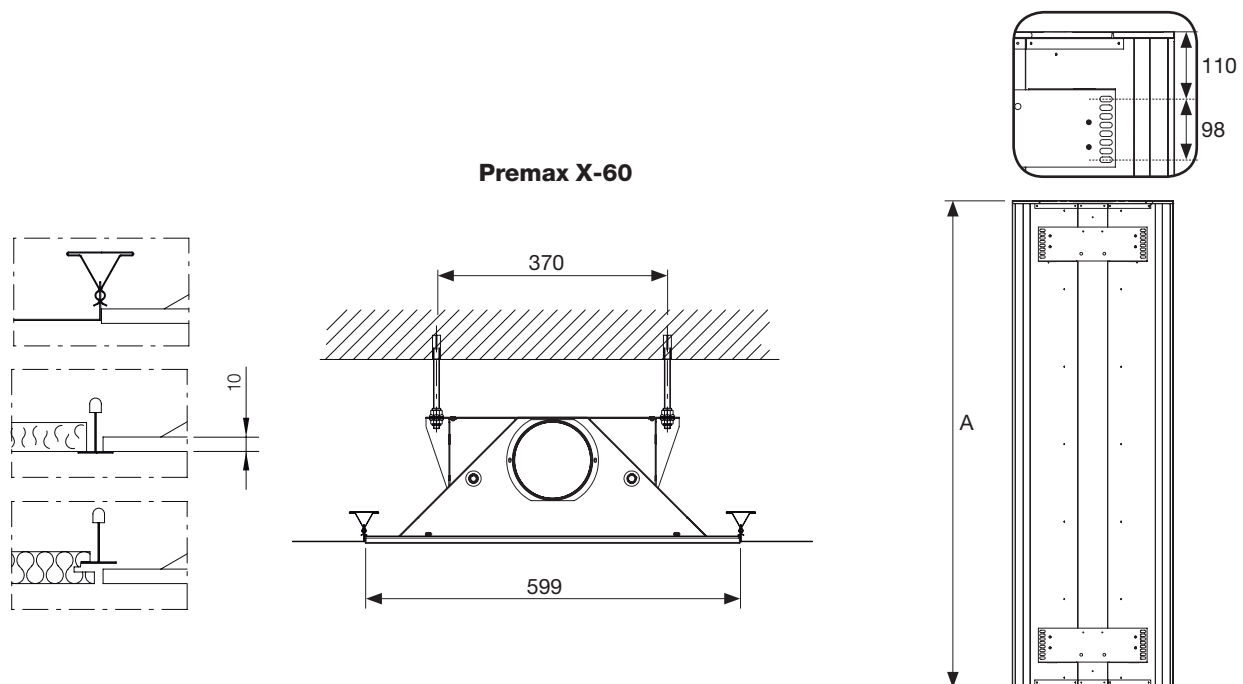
Premax X-60 suspension, dimensions. Suspension components are not supplied as part of the standard package.
